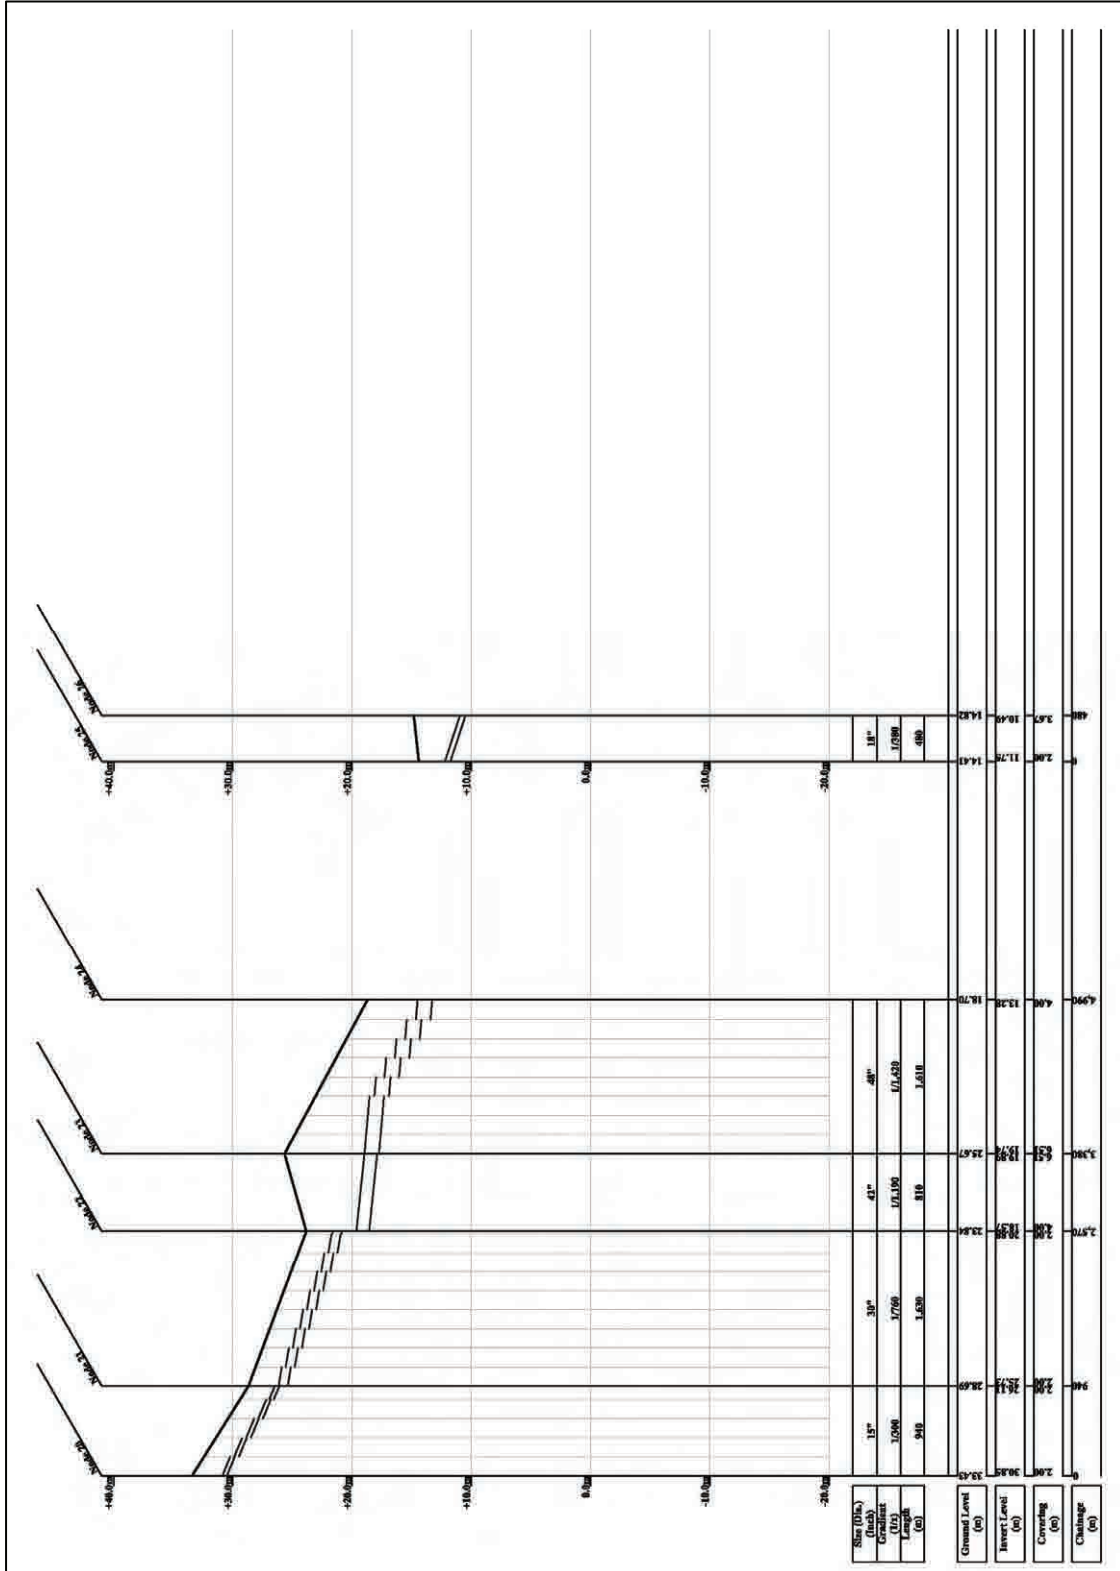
Longitudinal Section of Trunk Sewer and Sub-main Sewer (3/4)
